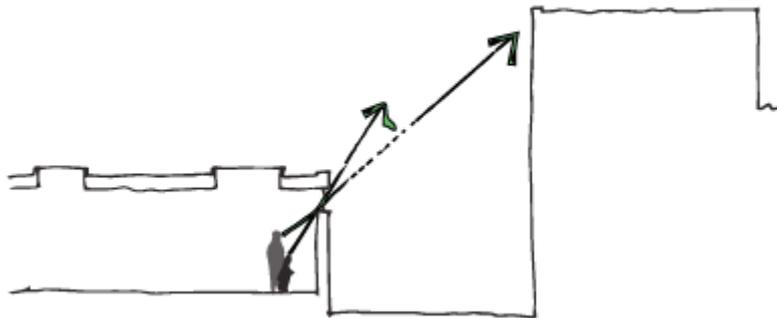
Drawing showing relationship with proposed high level windows on the east elevation and properties along Rosa Alba Mews
